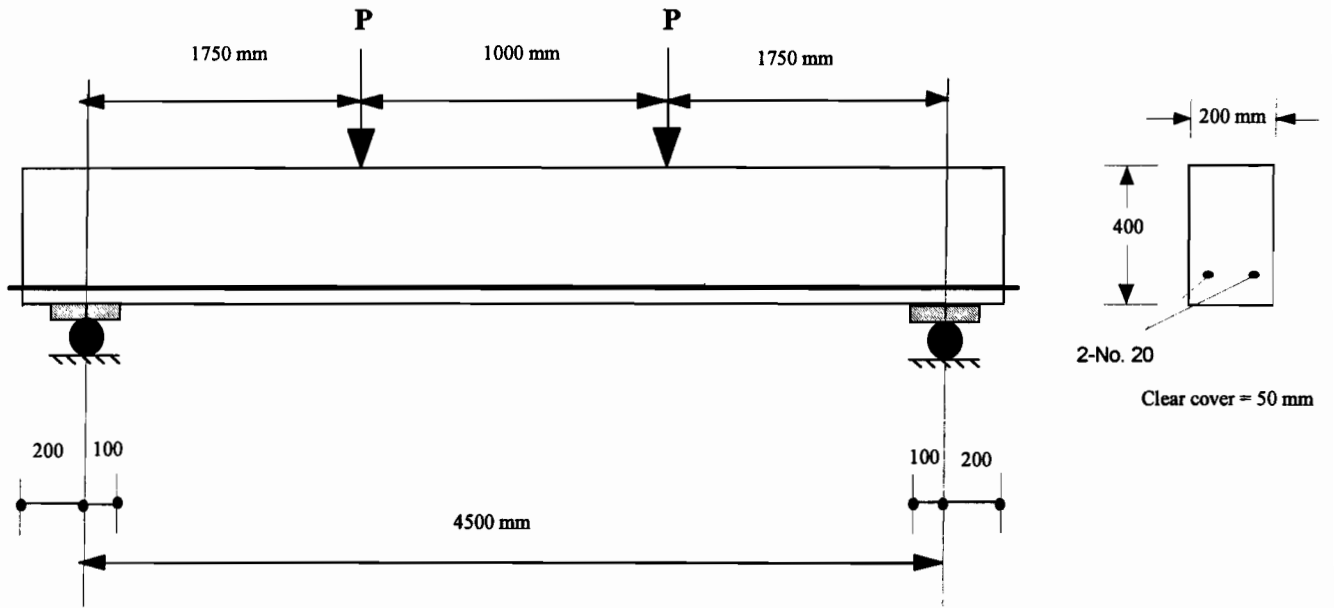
Geometry and reinforcement details of beams tested by Abrishami et al. (1995)
